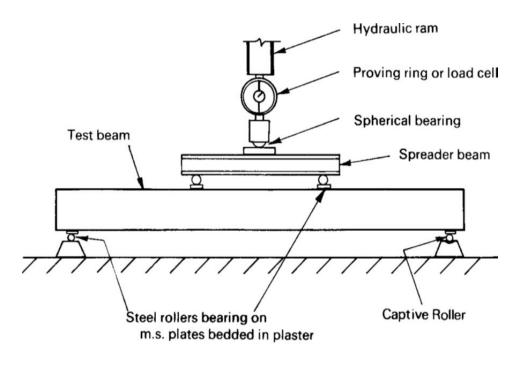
Laboratory beam load test arrangement in Bungey, Millard. and Grantham. 2006, p 172
